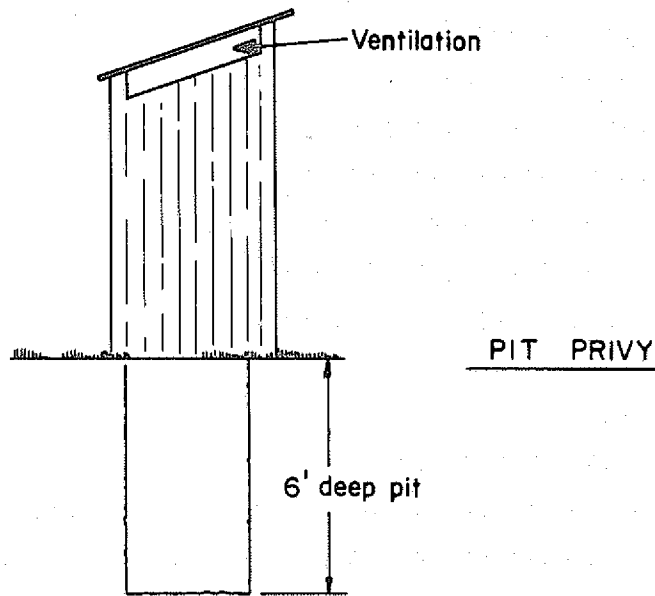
PRIMITIVE WASTE DISPOSAL FACILITIES
